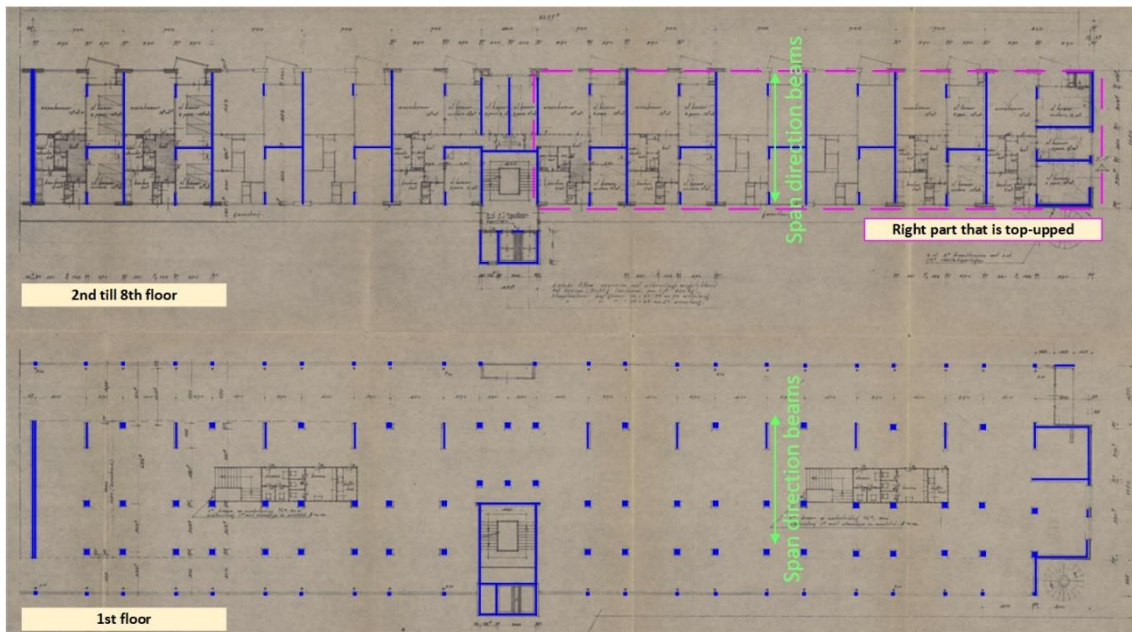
Existing structural system of De Boelelaan. Blue: structural elements; Rose: part that will be top-upped (Archive municipality Amsterdam, 2022; Adapted by author).
